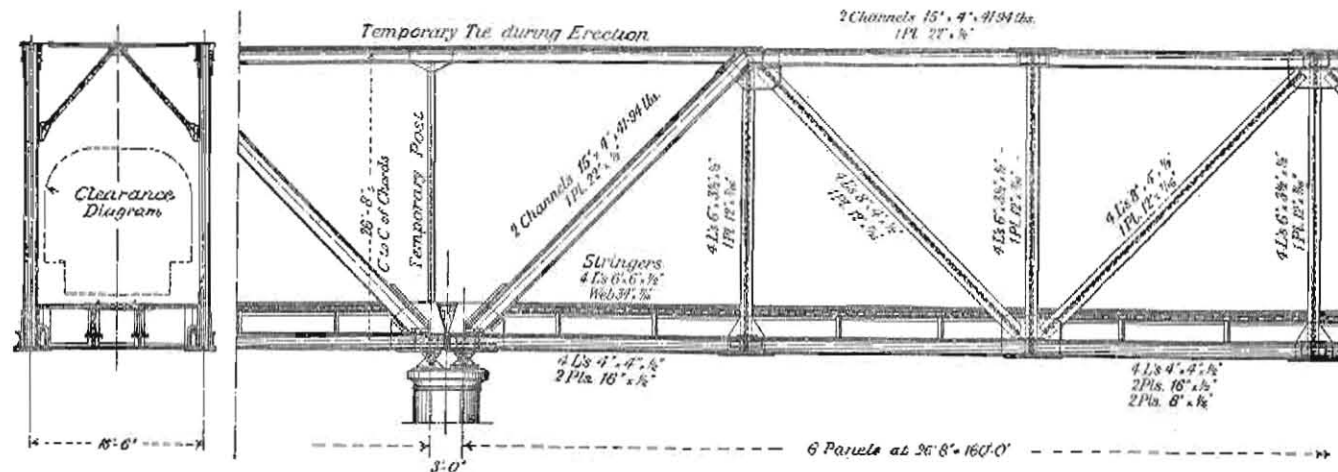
ELEVATION AND SECTION OF A TYPICAL SPAN
